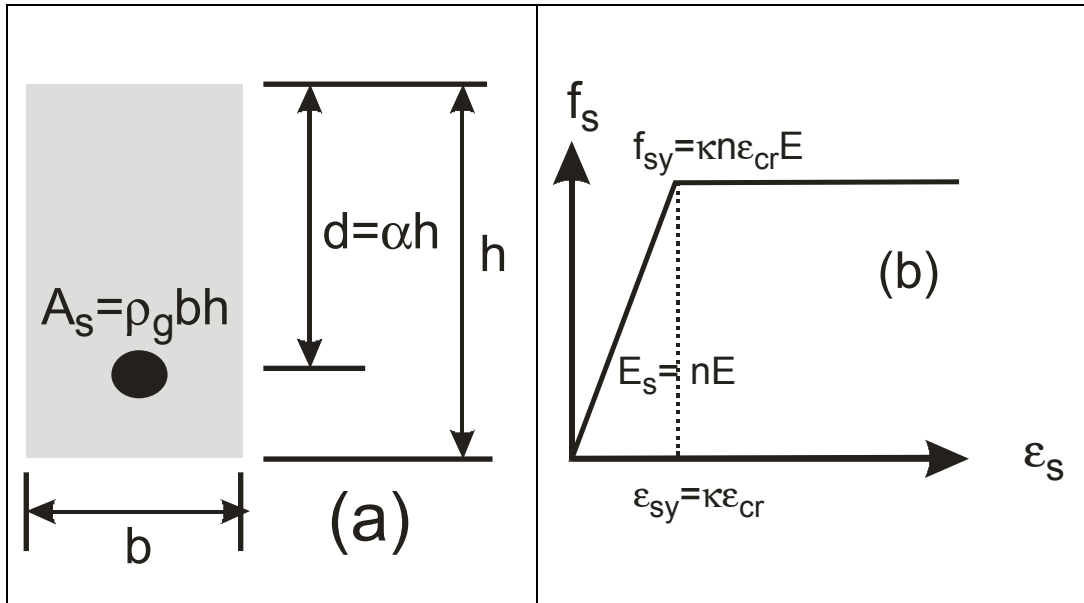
Material model for single reinforced concrete design (a) steel model; (b) beam cross section.
